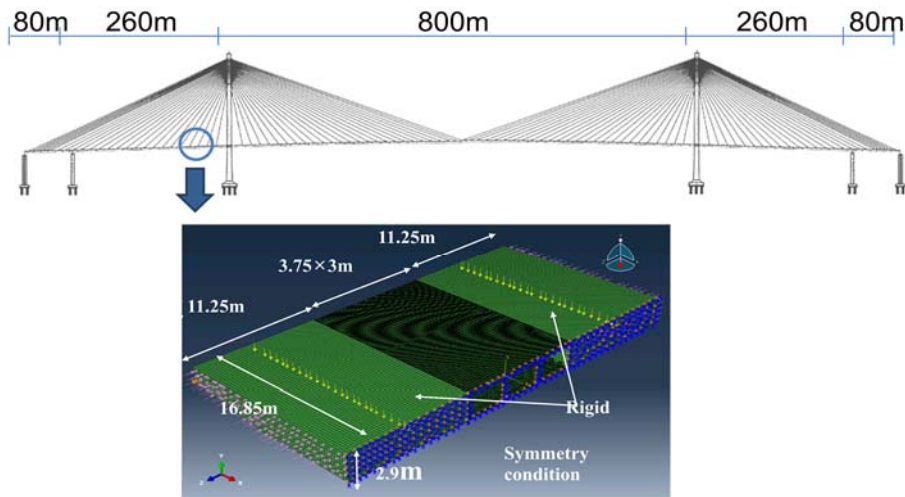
FE model of Wide type steel box girder of Incheon long-span bridge
